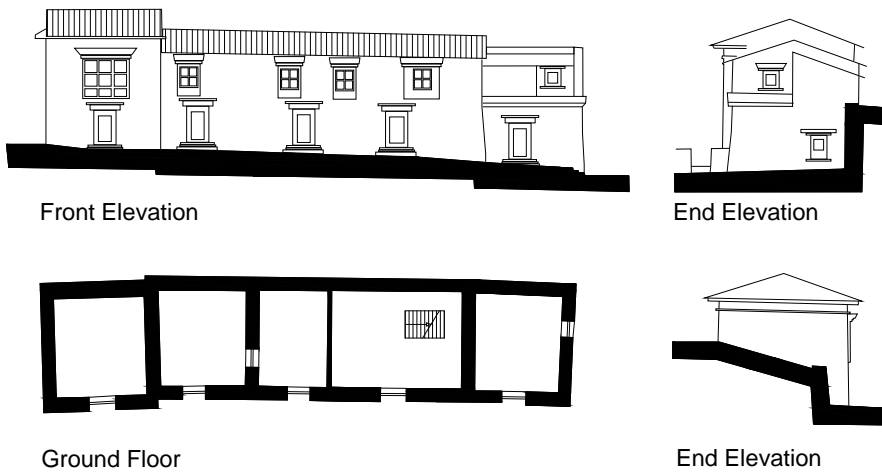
Floor plan and elevation of Sherpa house (after [17])
